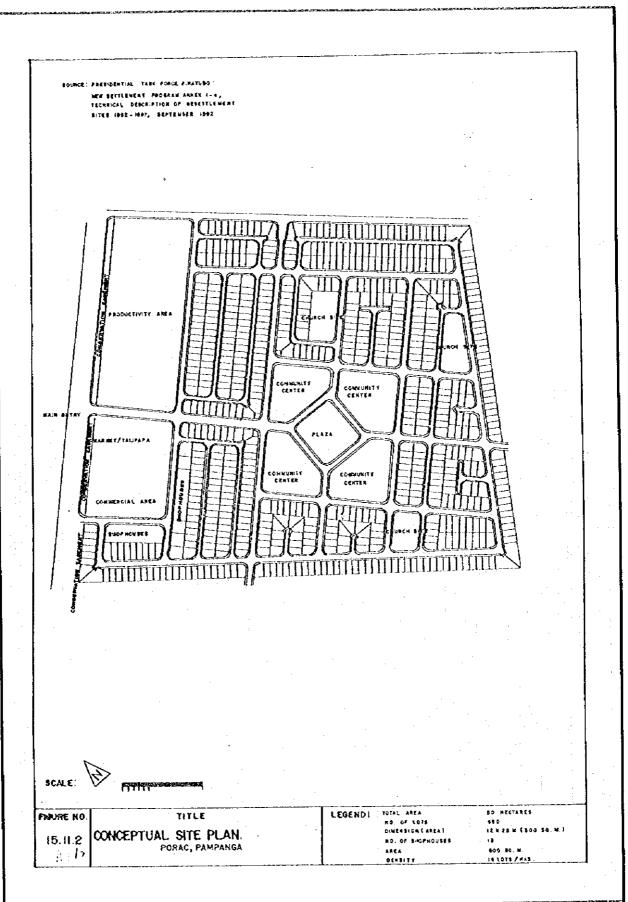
Conceptual Resettlement Site Plan (2/3)
